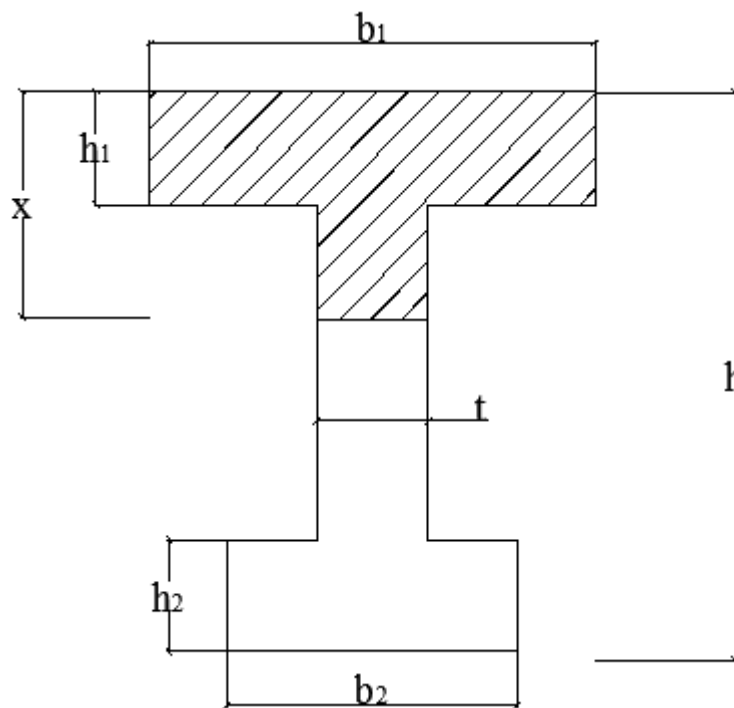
Scheme to determine the parameters of the approximant for a reinforced concrete I-section with a normal crack.
